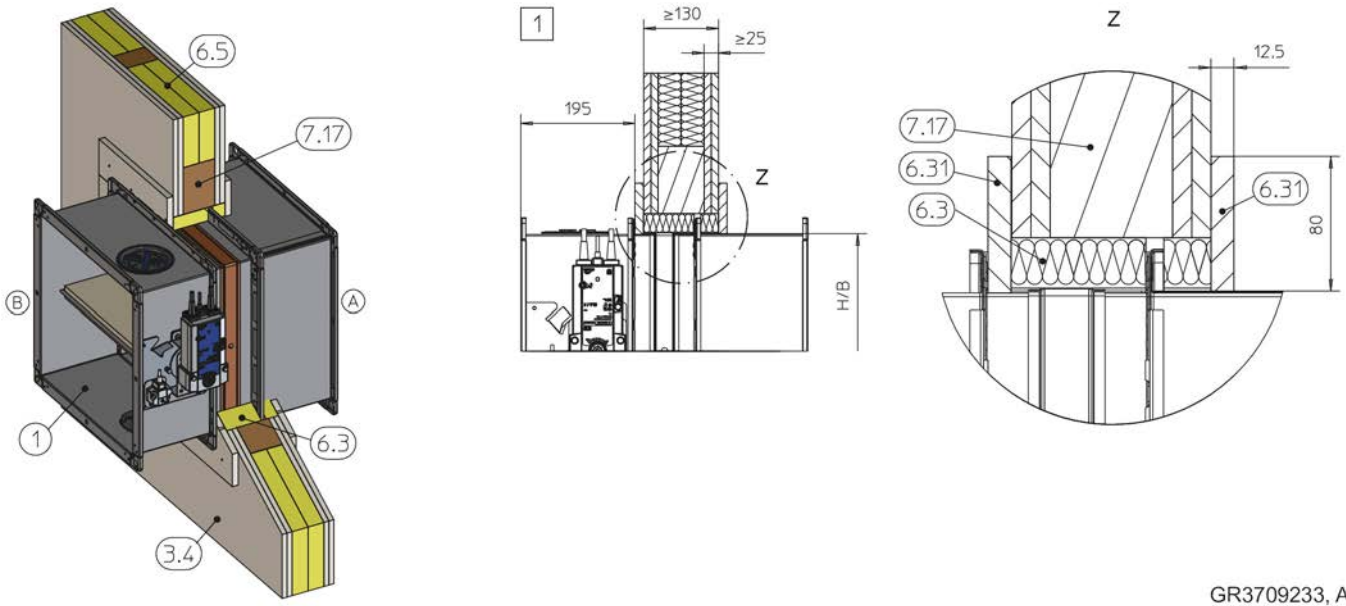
Dry mortarless installation into a half-timbered construction, with installation kit ES
